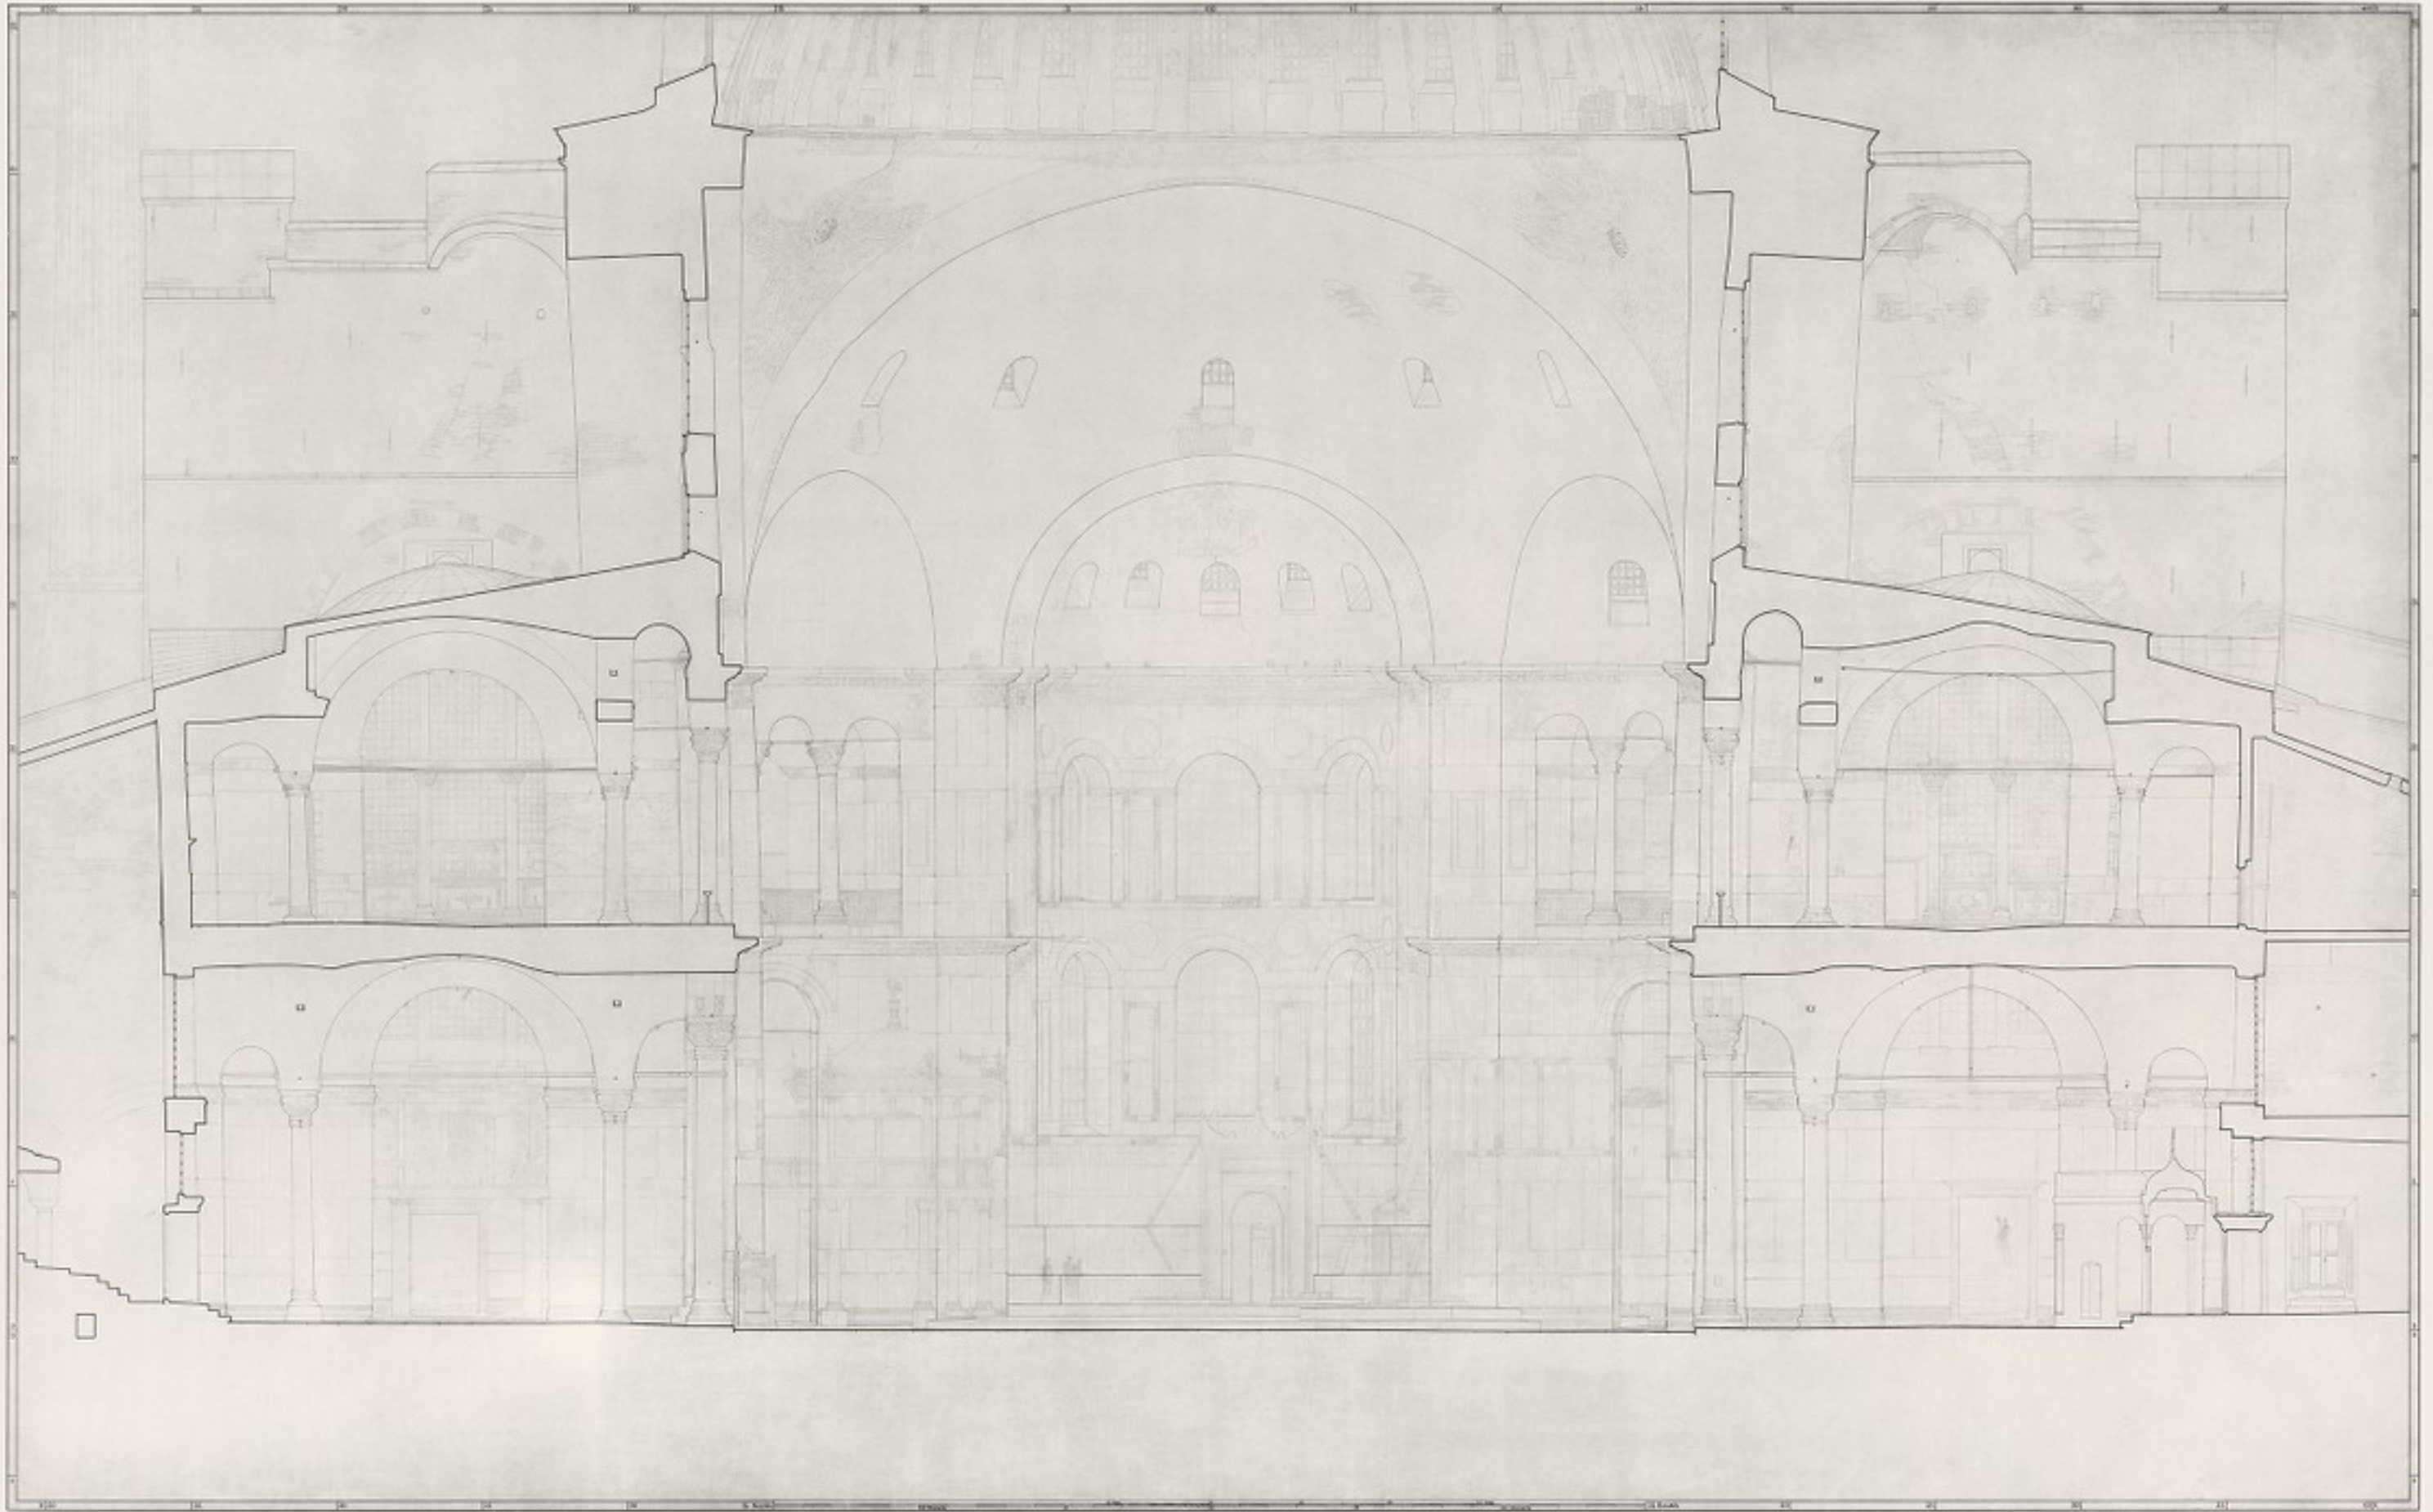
TRANSVERSE SECTION, LOOKING EAST
